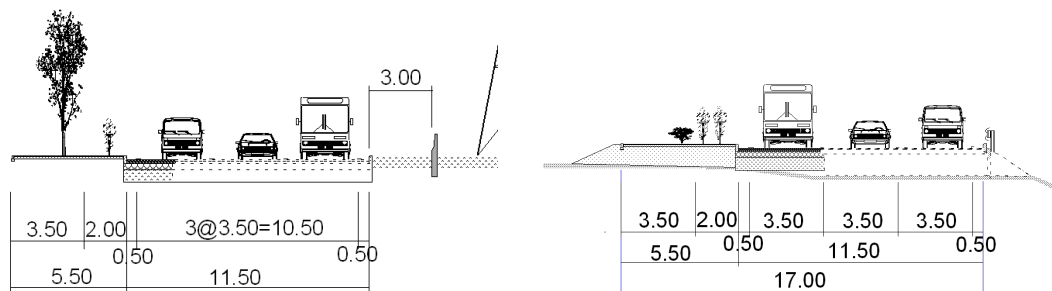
Cross Sections on Widening Segments Assumed for Costing
